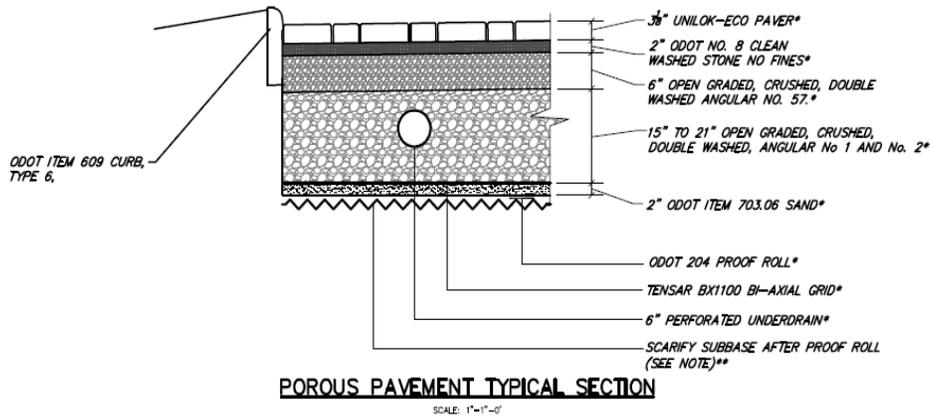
Elevating the underdrain above the subgrade is another means of providing an internal water storage (IWS) zone. This design was used for the permeable pavement installation at Orange Village.
